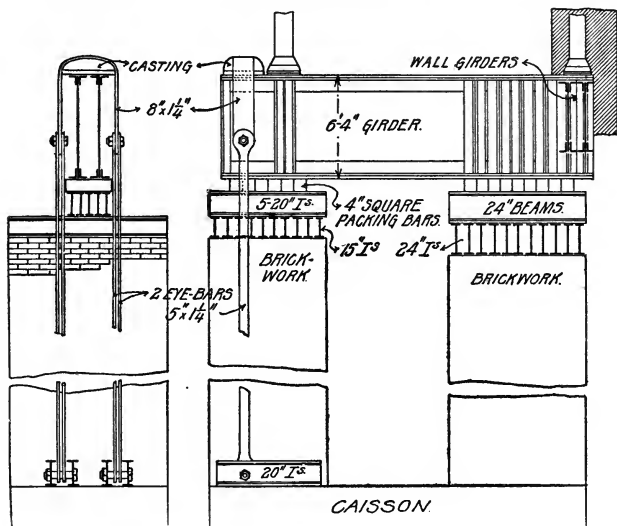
Foundation Piers, American Surety Co.'s Building, New York.
